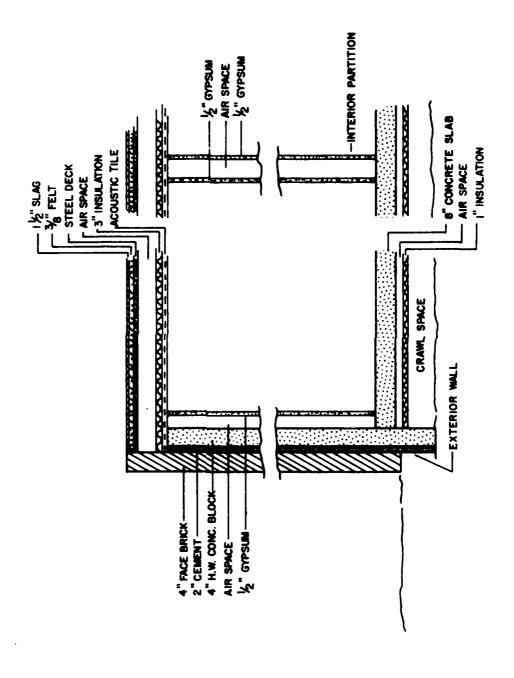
Wall, floor, and ceiling detail -- dental clinic.
